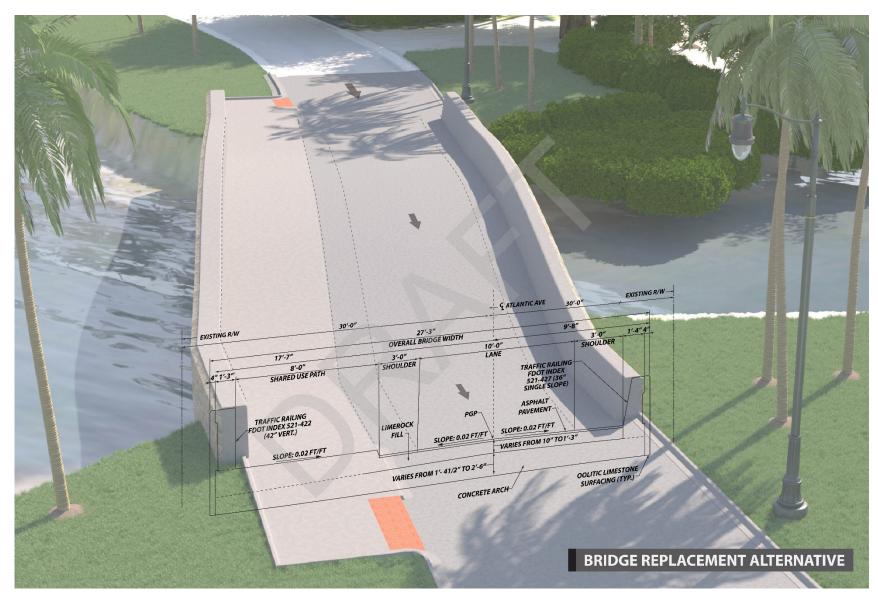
Build Alternative 2 – Replacement, Proposed Typical Section (Facing Northwest)
